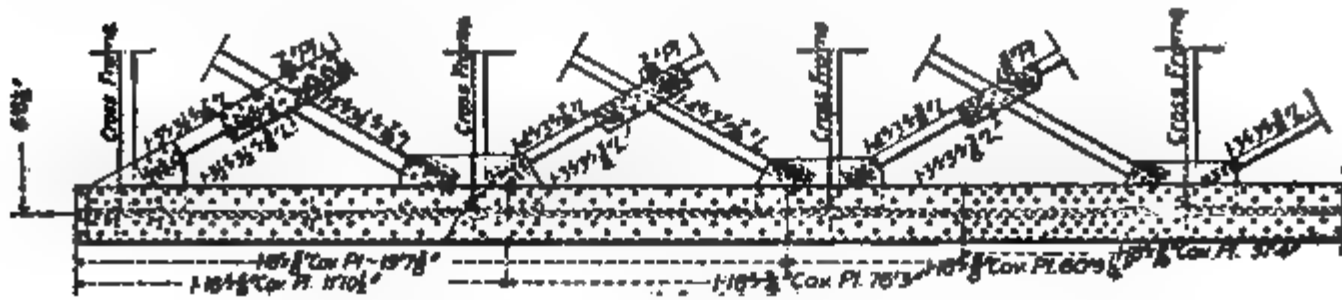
RAILWAY DECK PLATE GIRDER BRIDGE.
